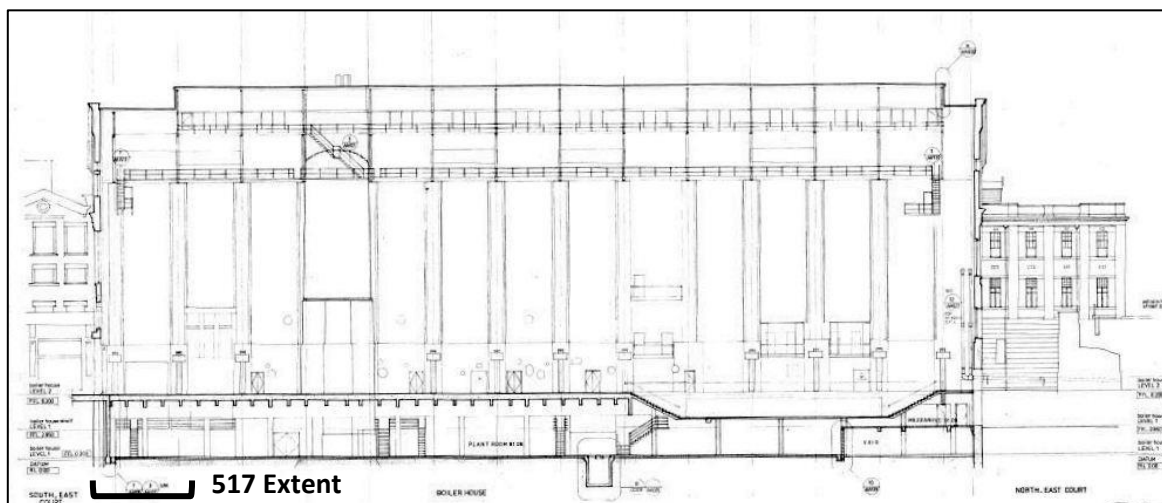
1984 MAAS Stage 2 Construction plan. Section 15 (bottom) faces East and depicts part of the Switch House, the Boiler House and North-East Court. The basement of the Boiler House is 6m deep. The approximate extent of 517 off Harris Street has been marked.
